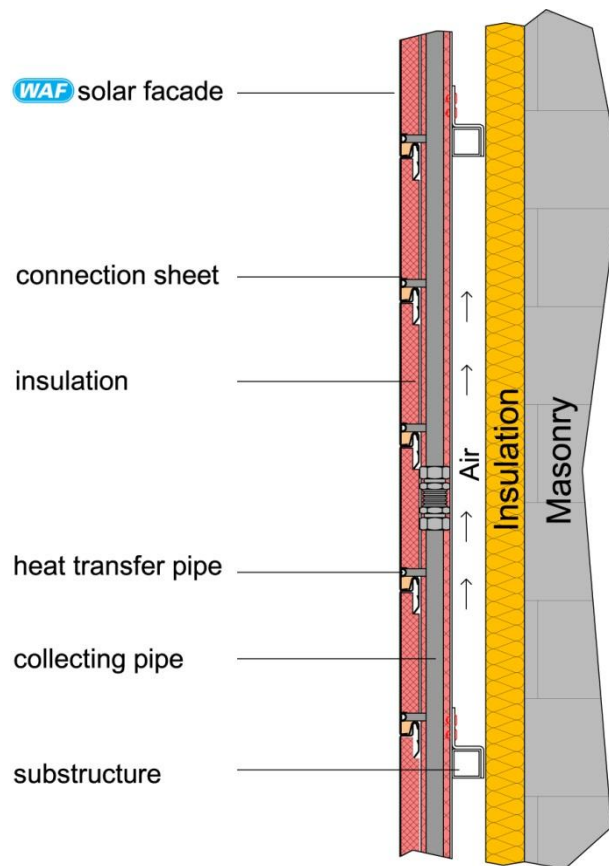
The structure of the WAF Solar Thermal Façade.
